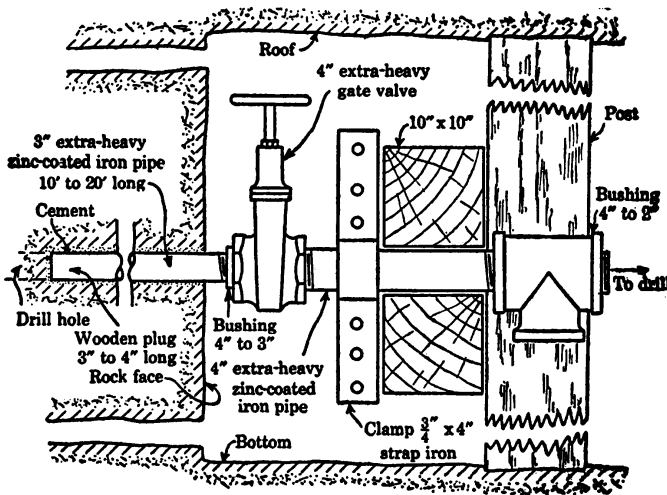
Valve and pipe arrangements for drilling New Castle mine
